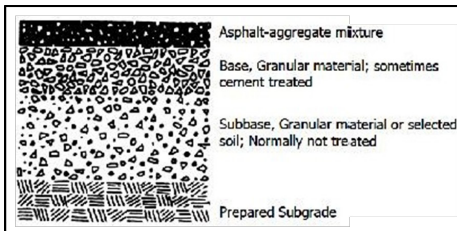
Asphalt Mix on Asphalt Pavement
